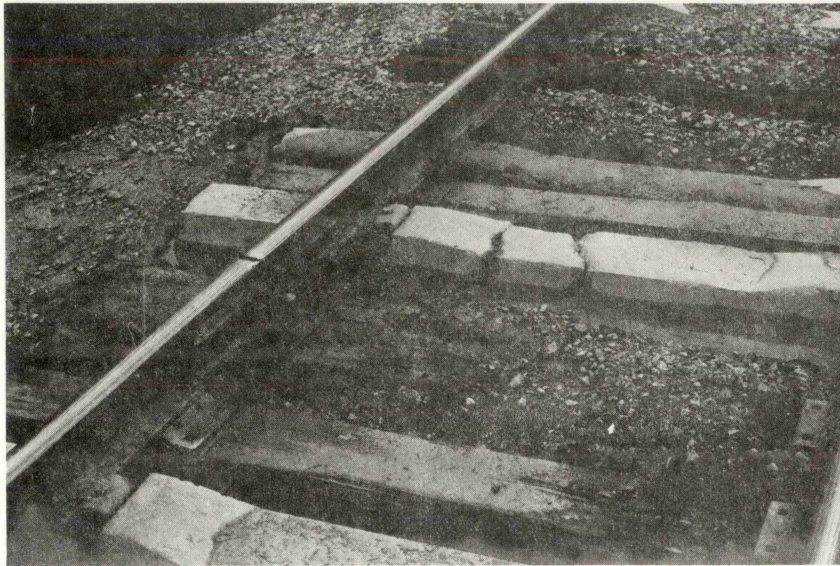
Spot replacement of wood ties with concrete ties causing degradation of "soft" ballast and resulting in pumping. Ties cracked due to loss of support (2)
